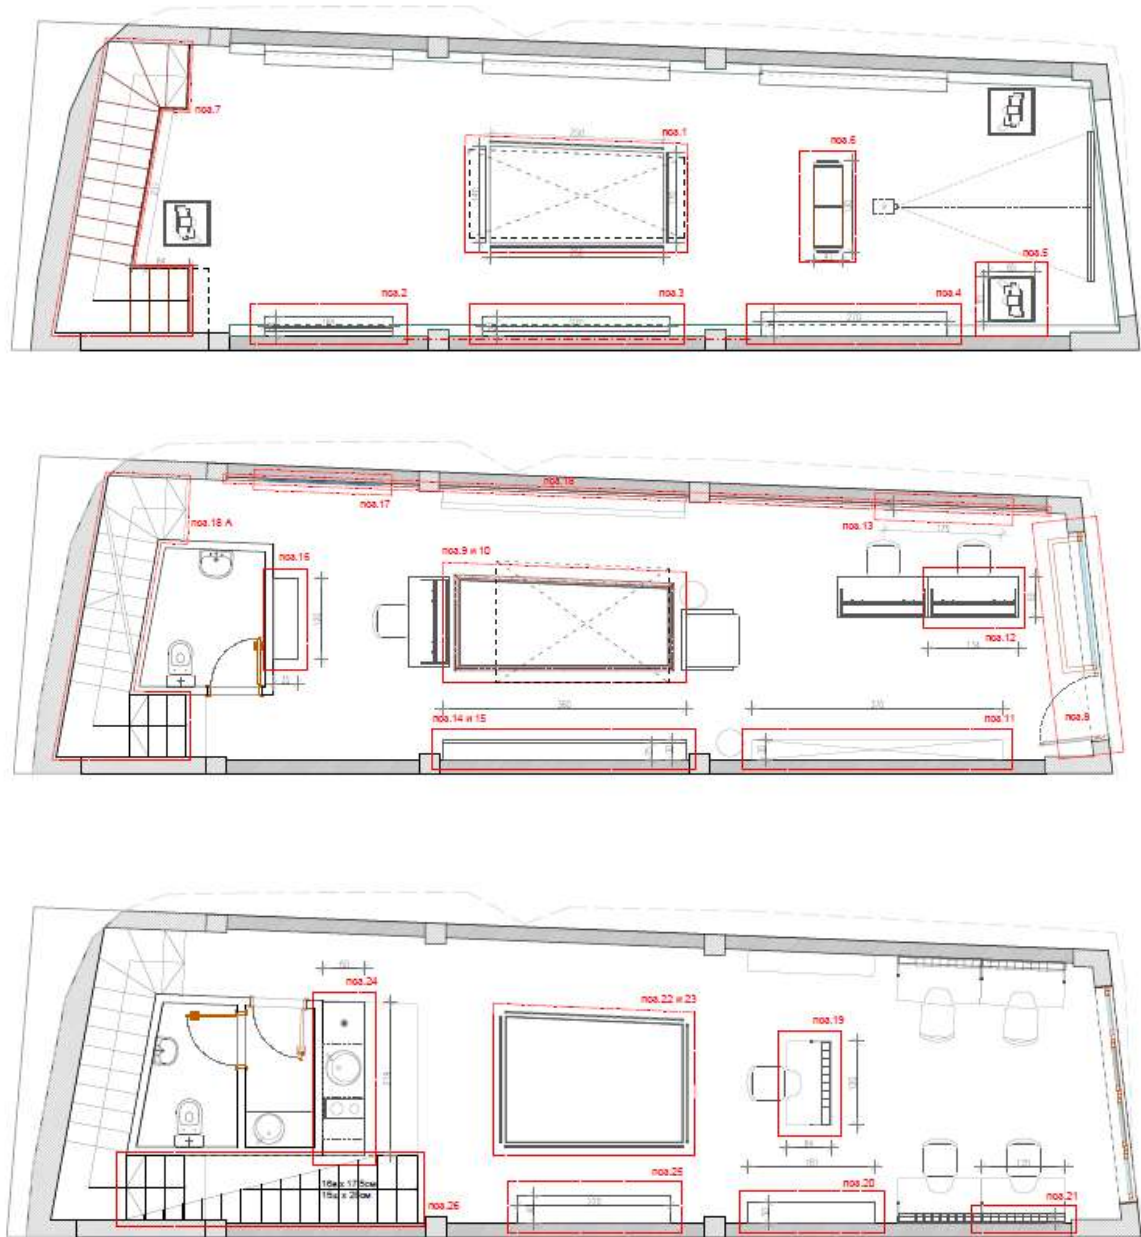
Situation of basement, ground floor and first floor with furniture according to new detail design (functional solution)
